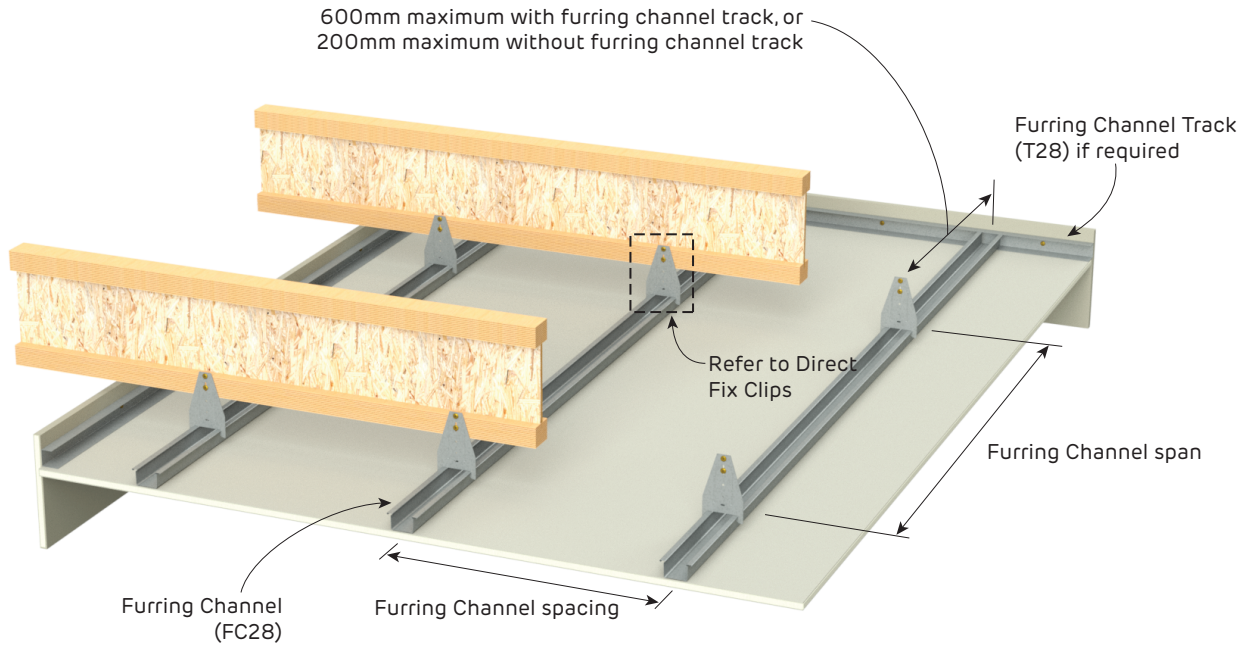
Direct Fix Furring Channel Ceiling Frame
